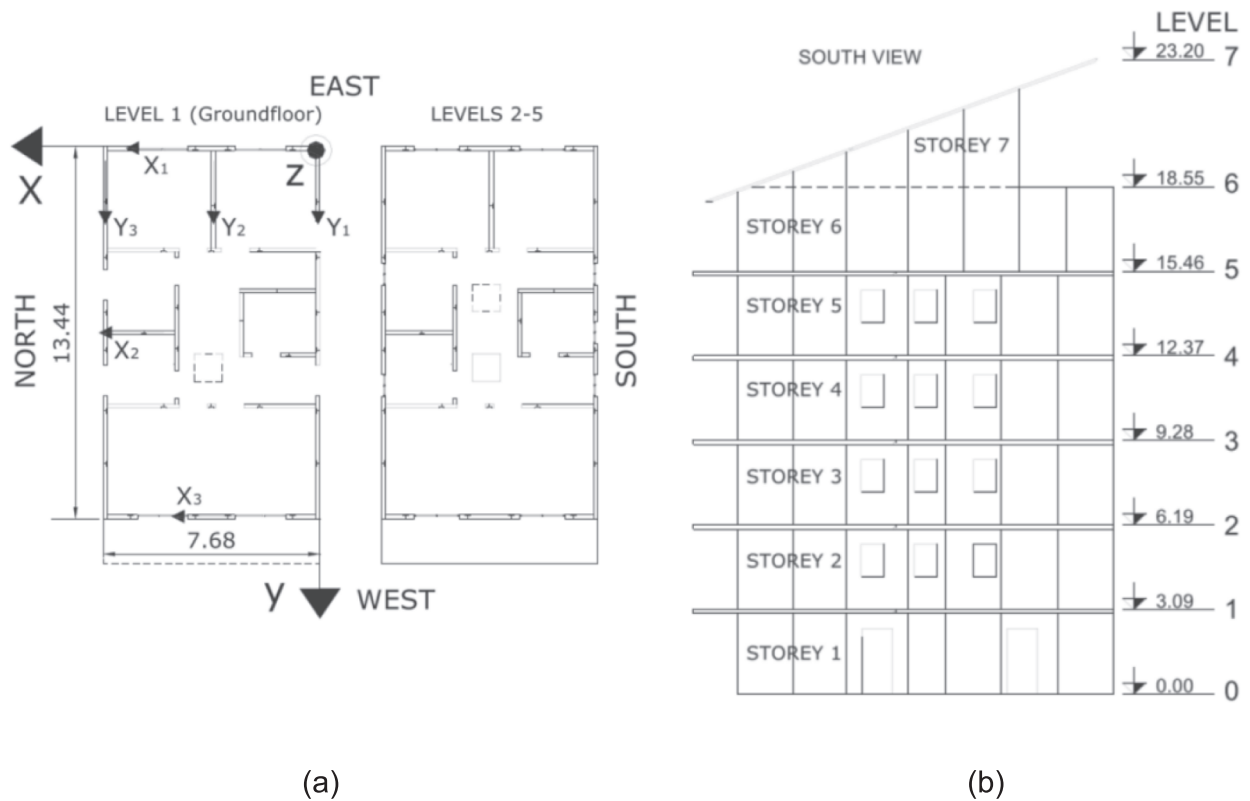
(a) Plan views of the CLT structure; (b) South elevation view of the CLT structure [14].
